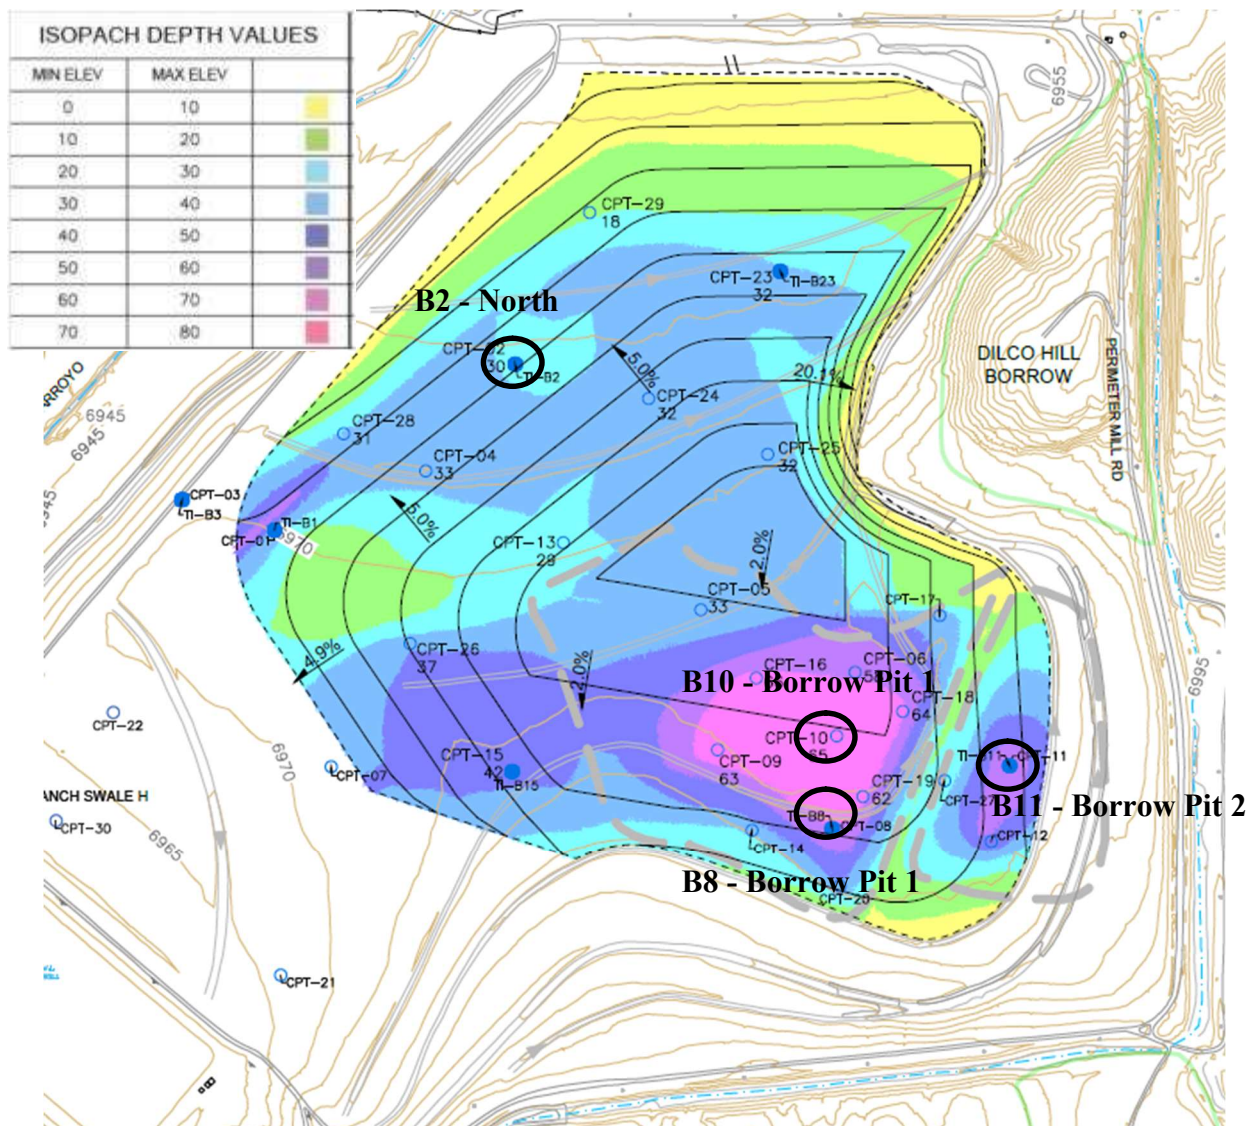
Repository Plan: Depth of Planned Finished Grade to Base of Tailings
